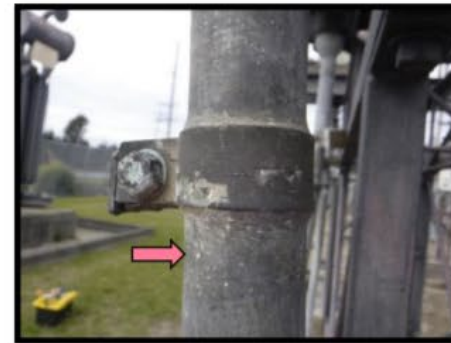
Yard, ground floor, external, 33 kV feeders, residue to cables - Positive Asbestos Debris
